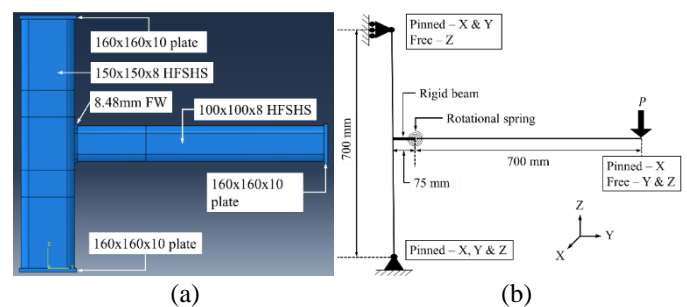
Welded tubular T-joint in; (a) 3D solid model and; (b) 1D line element model.
